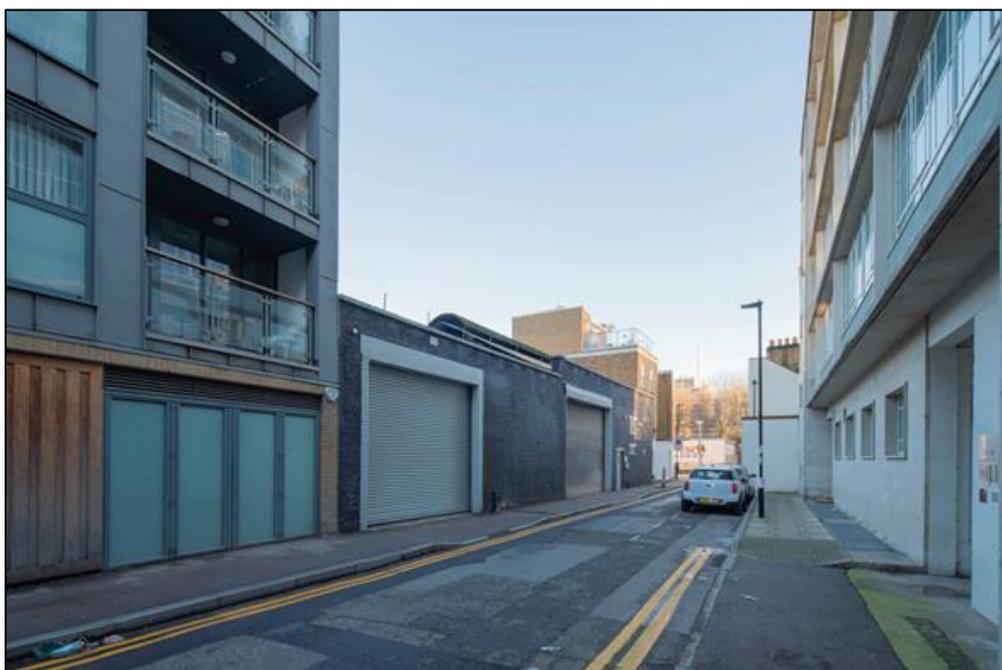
The existing front elevation looking north-east along Bastwick Street towards the junction with Central Street
